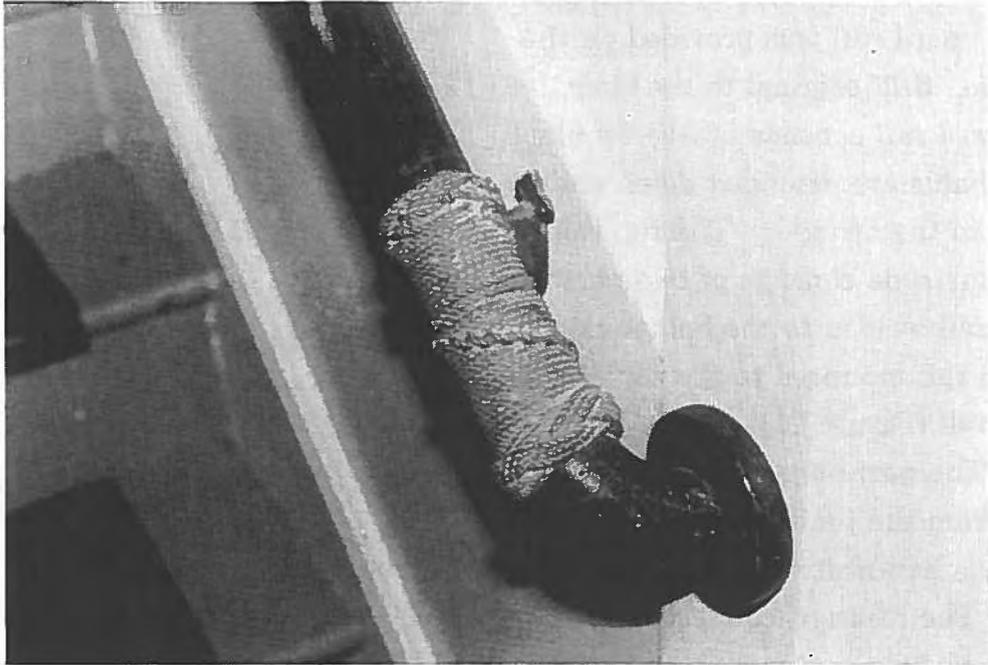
Nautical-type twisted cord detail on first floor stair handrailing.
